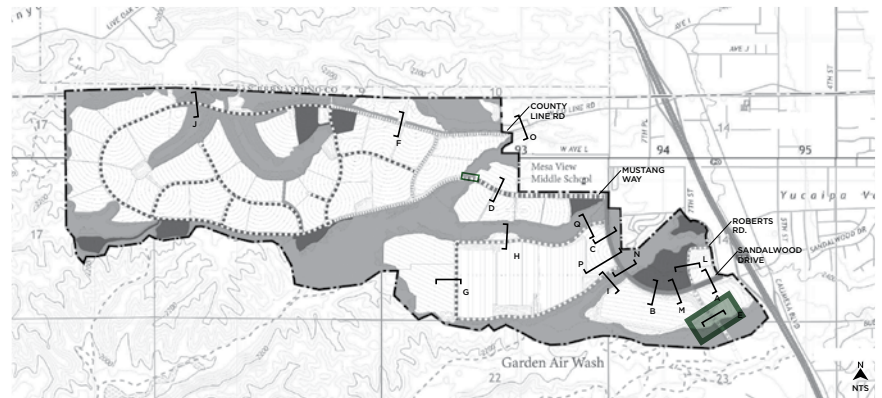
ENLARGEMENT MODIFIED SECONDARY STREET SECTION E
